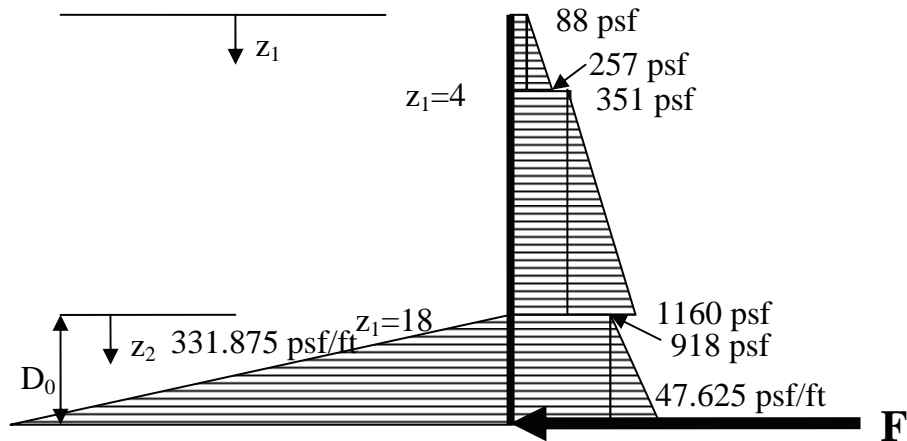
Earth Pressure Diagram for Drilled Shaft Wall Example Problem
